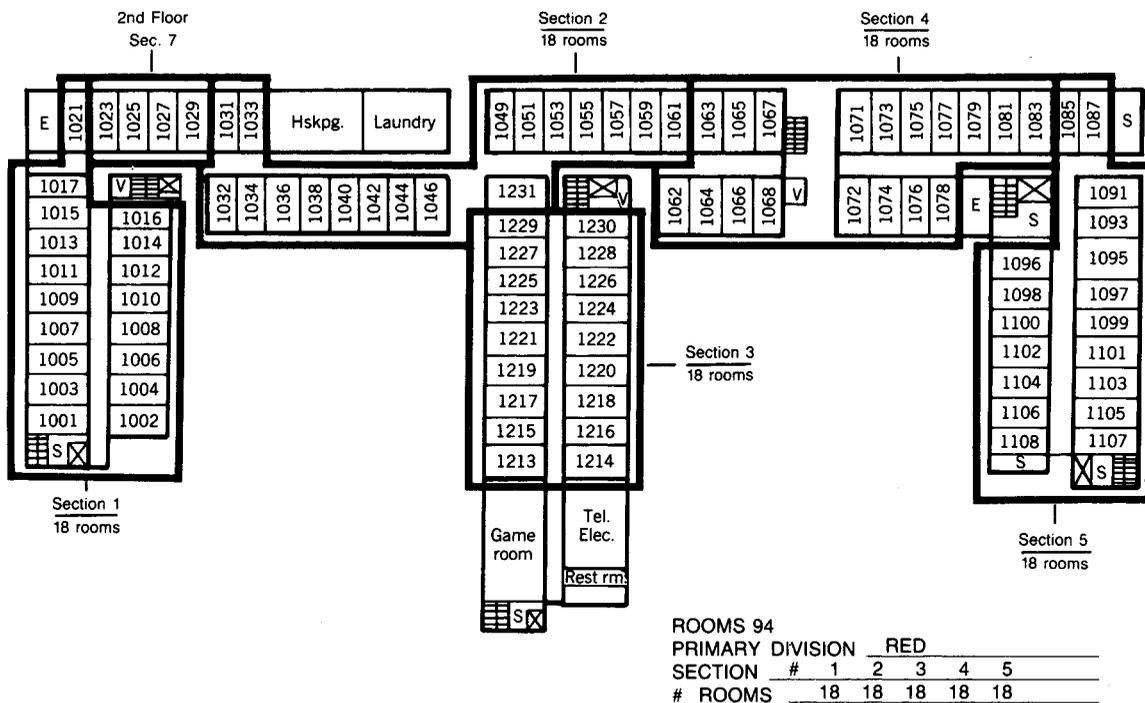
House Breakout Plan of the model hotel; first floor. S, storage; V, vending; E, electrical switch room; X, elevator; GL, guest laundry.
